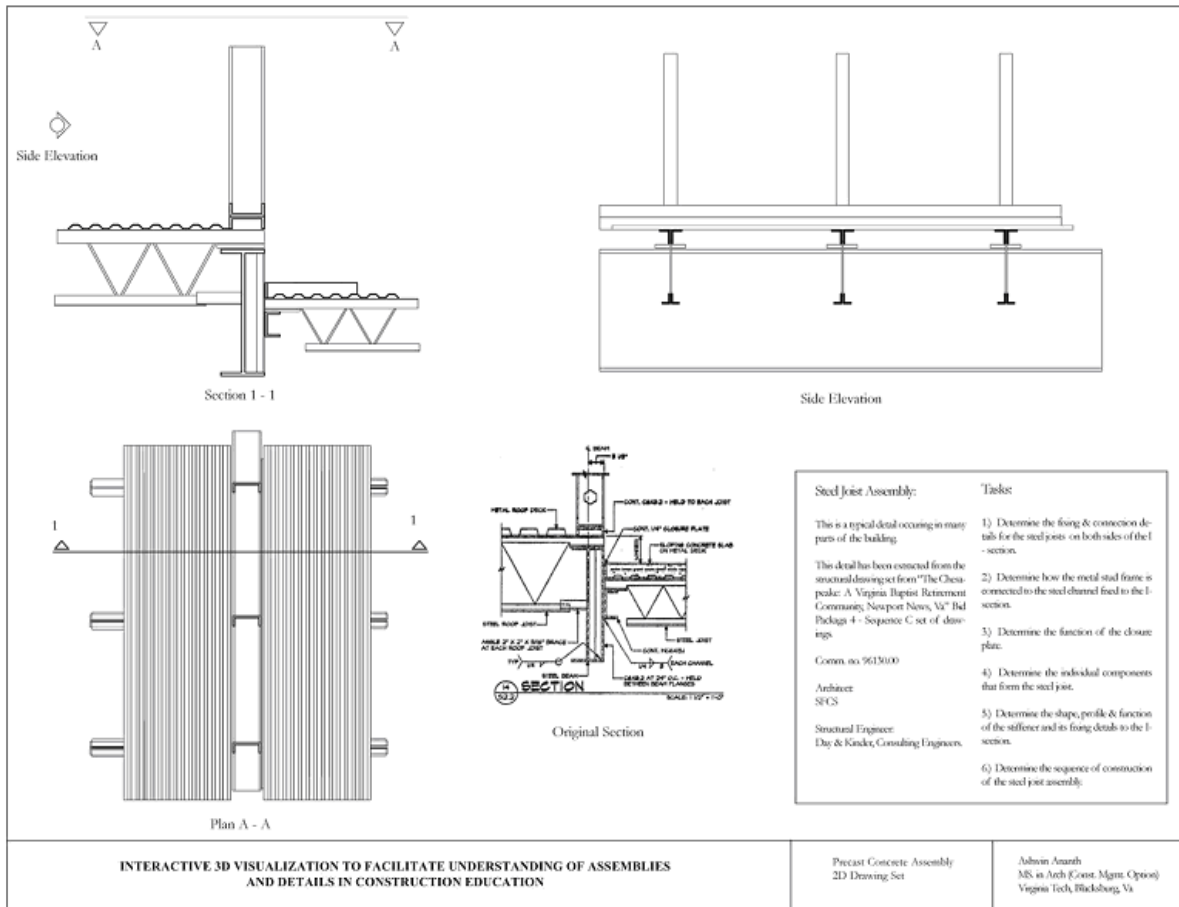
Example 2D Drawing (Steel Joist Assembly Detail)
